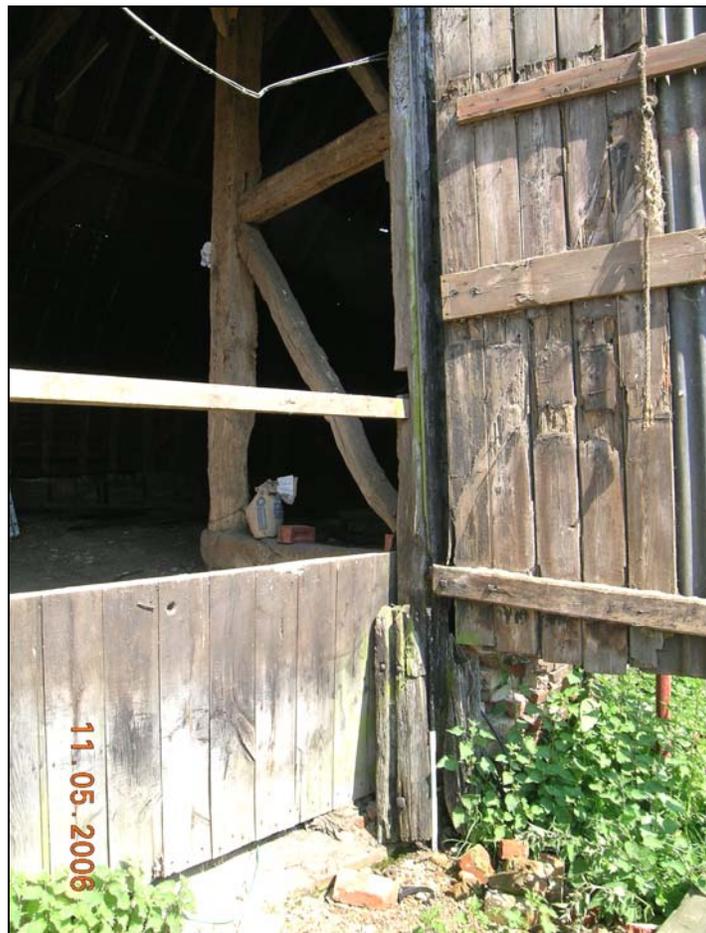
Leap slot on entrance to brick threshing floor on south-east side
